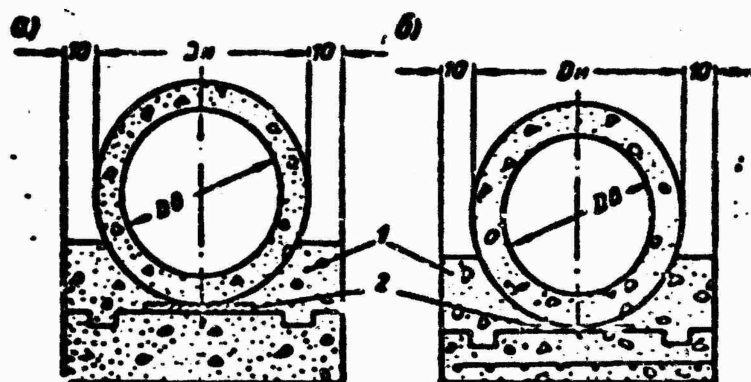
Monolithic foundations. 1) Concrete; 2) cement grout (1:3).
